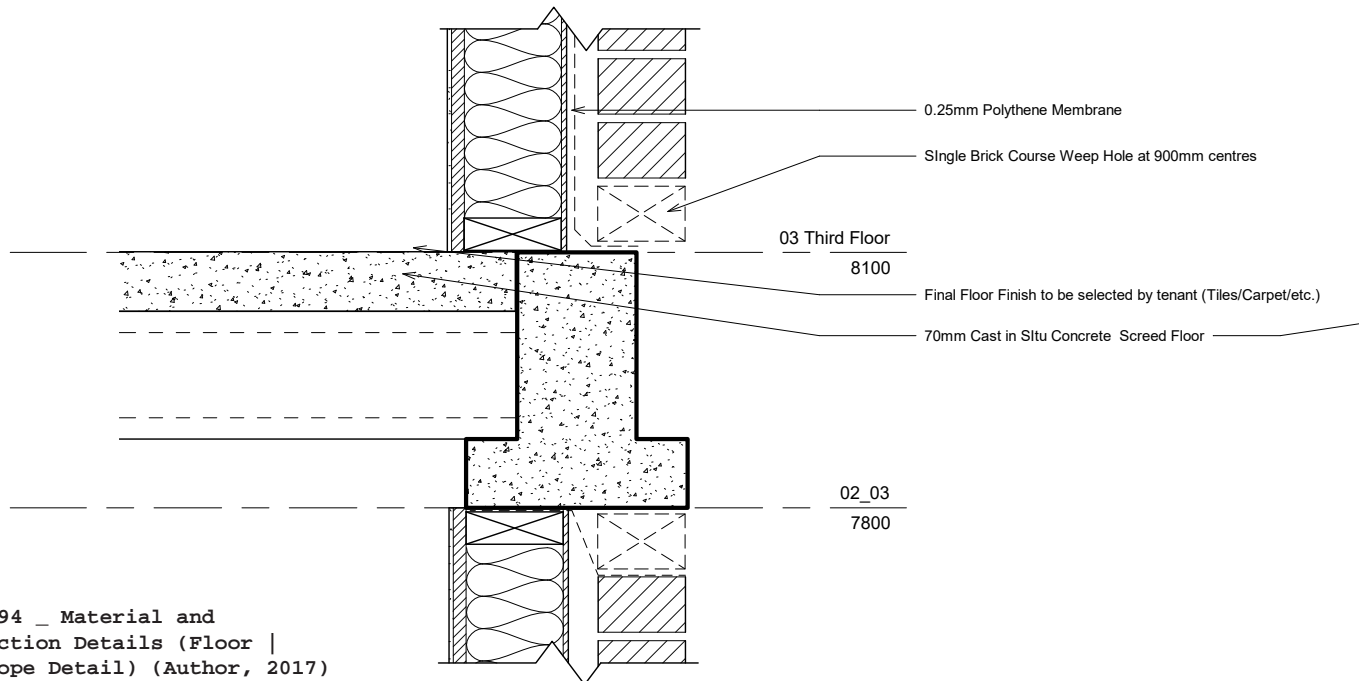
Material and Connection Details (Floor | Envelope Detail) (Author, 2017)
